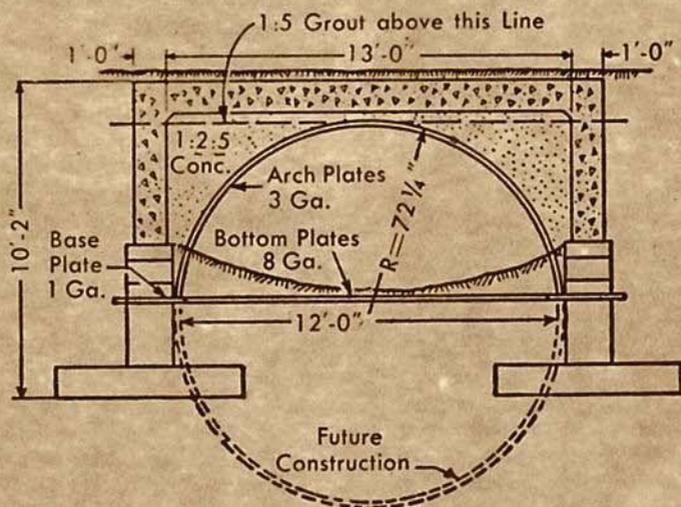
Cross-section of 1100-ft concrete box culvert reinforced with steel arch to withstand heavier plane loads on midwestern airport.
